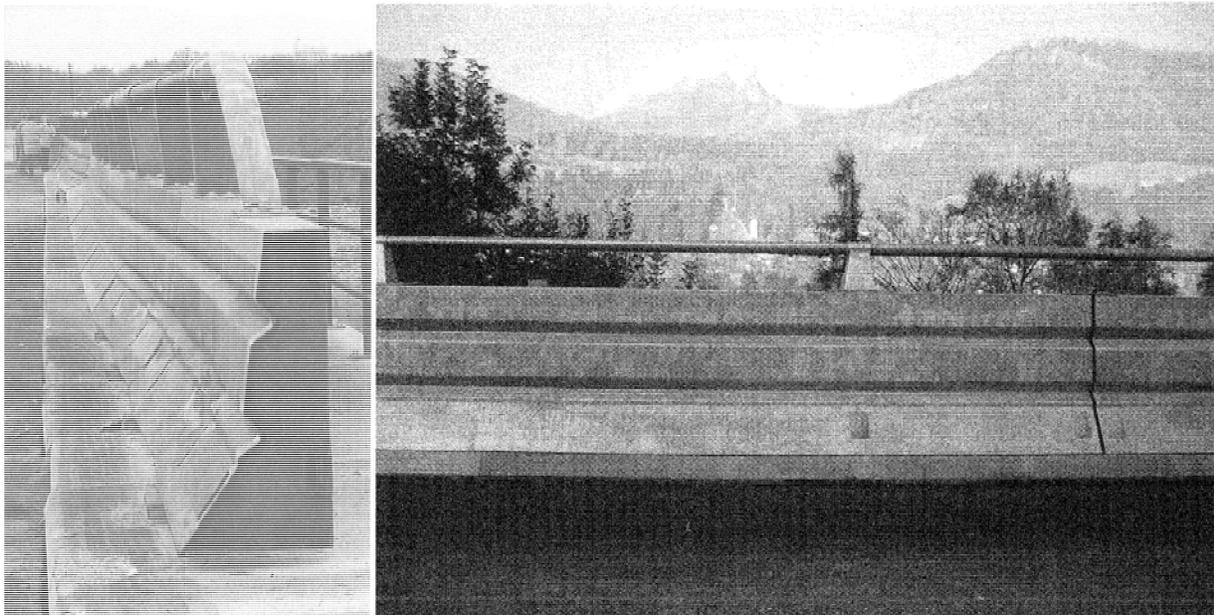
Modified breakaway bridge railing (Bunnell et al. 1995).
